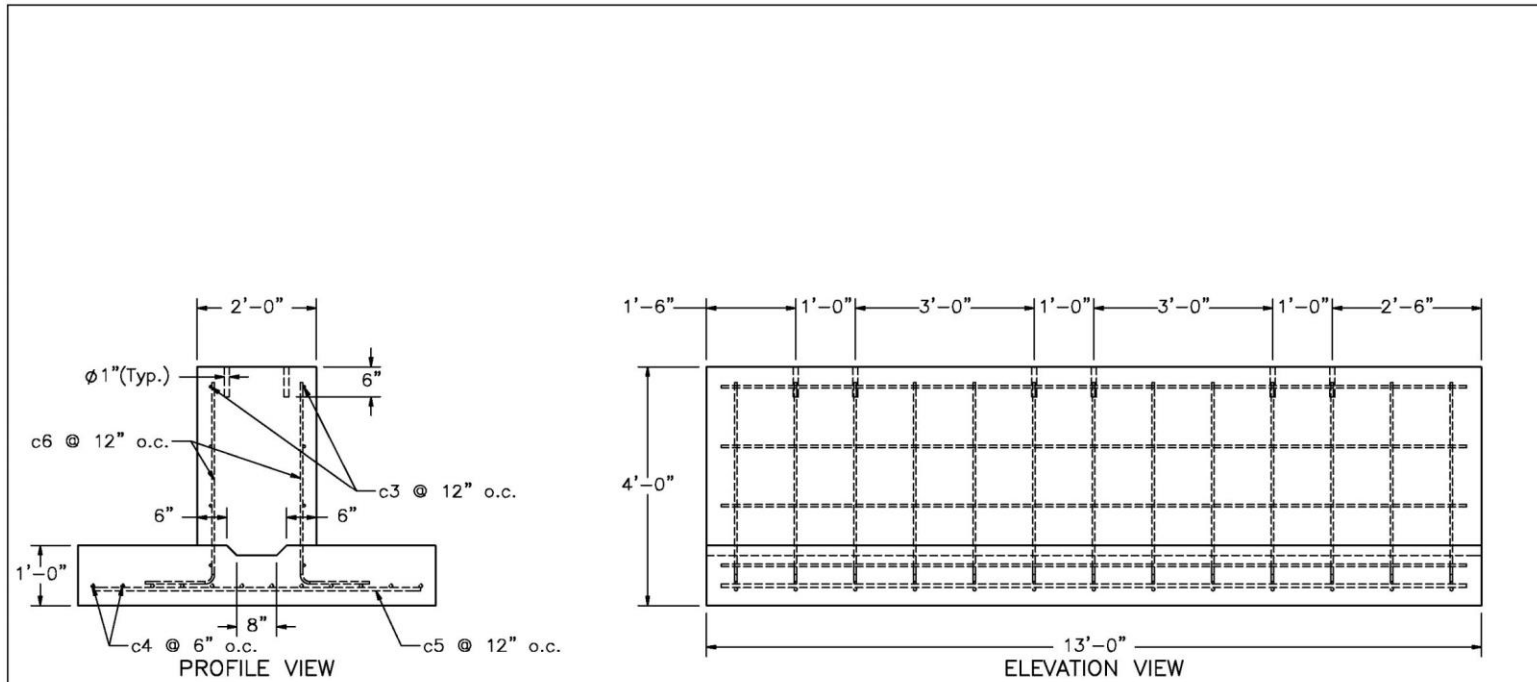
USDA-FS-NTDP Low-Height, Glulam Timber Bridge Rail: Sample Bridge Abutment Details (Laboratory Specimens Only)
